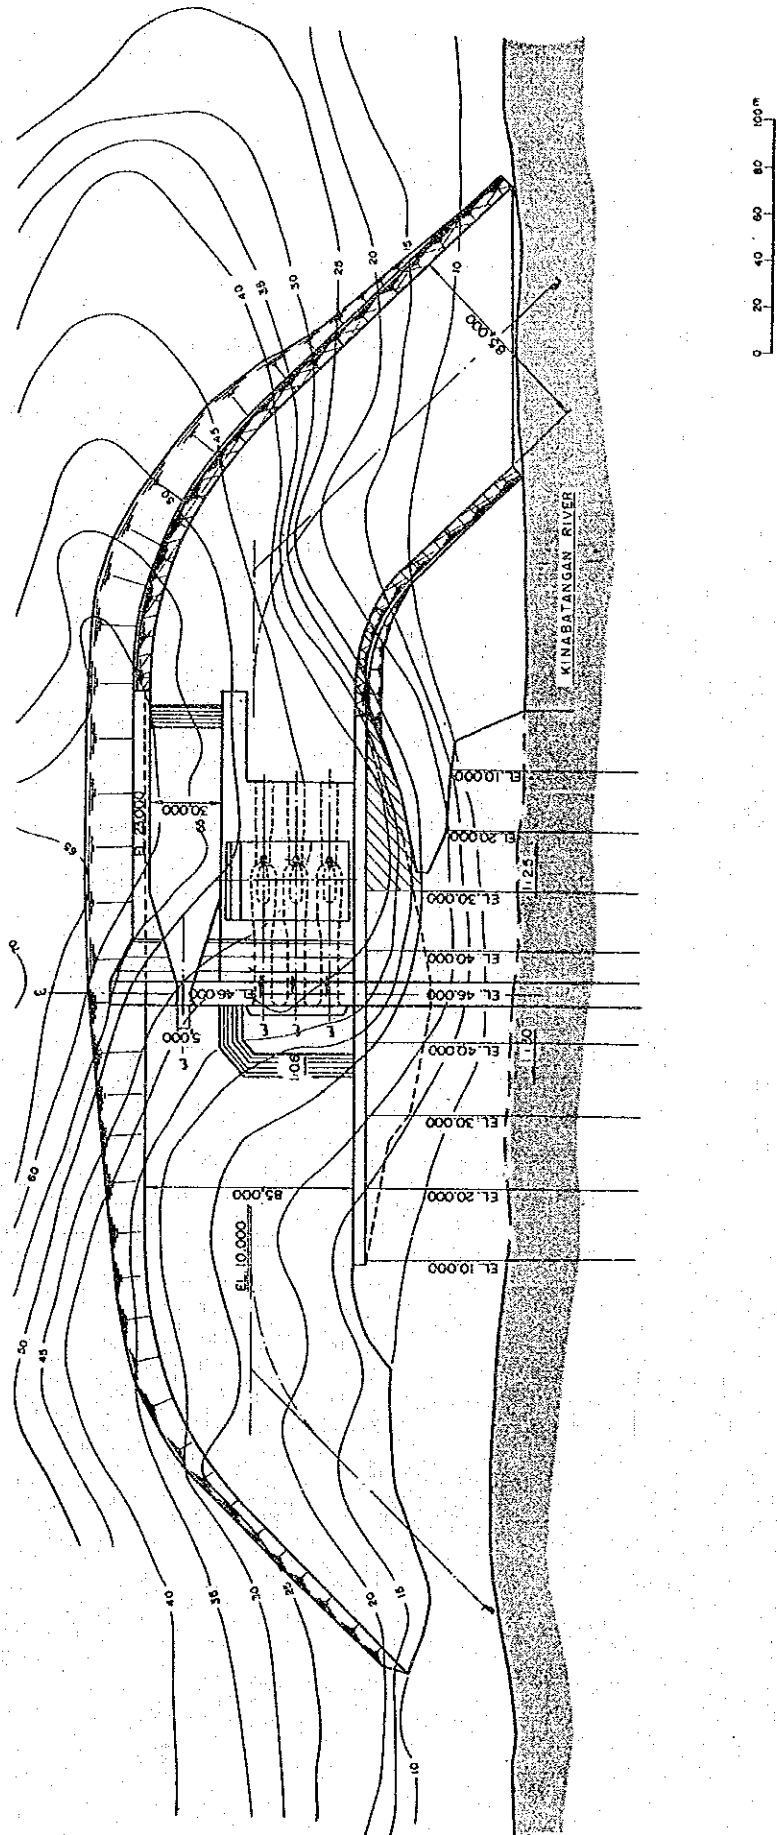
TYPICAL LAYOUT OF FIELD STRUCTURE
